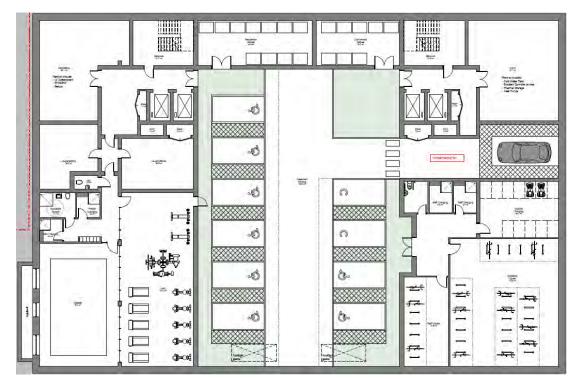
Barton Wilmore Proposed Basement Plan ref: 27463 A-P11-00A (Full drawing included in Appendix C)
